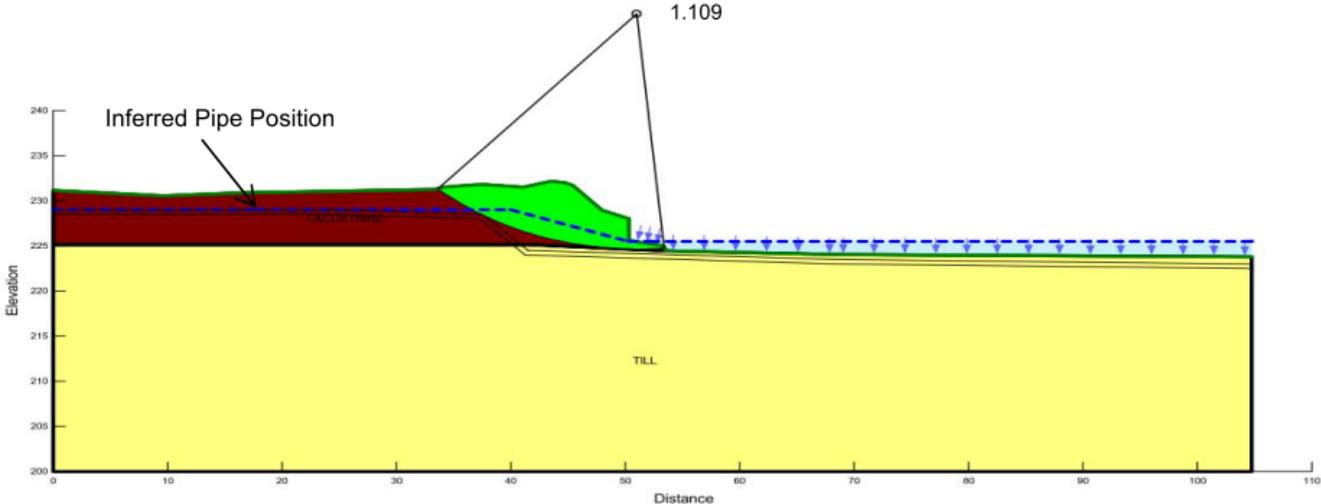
Slope Failure Planes – St. James Water Main
